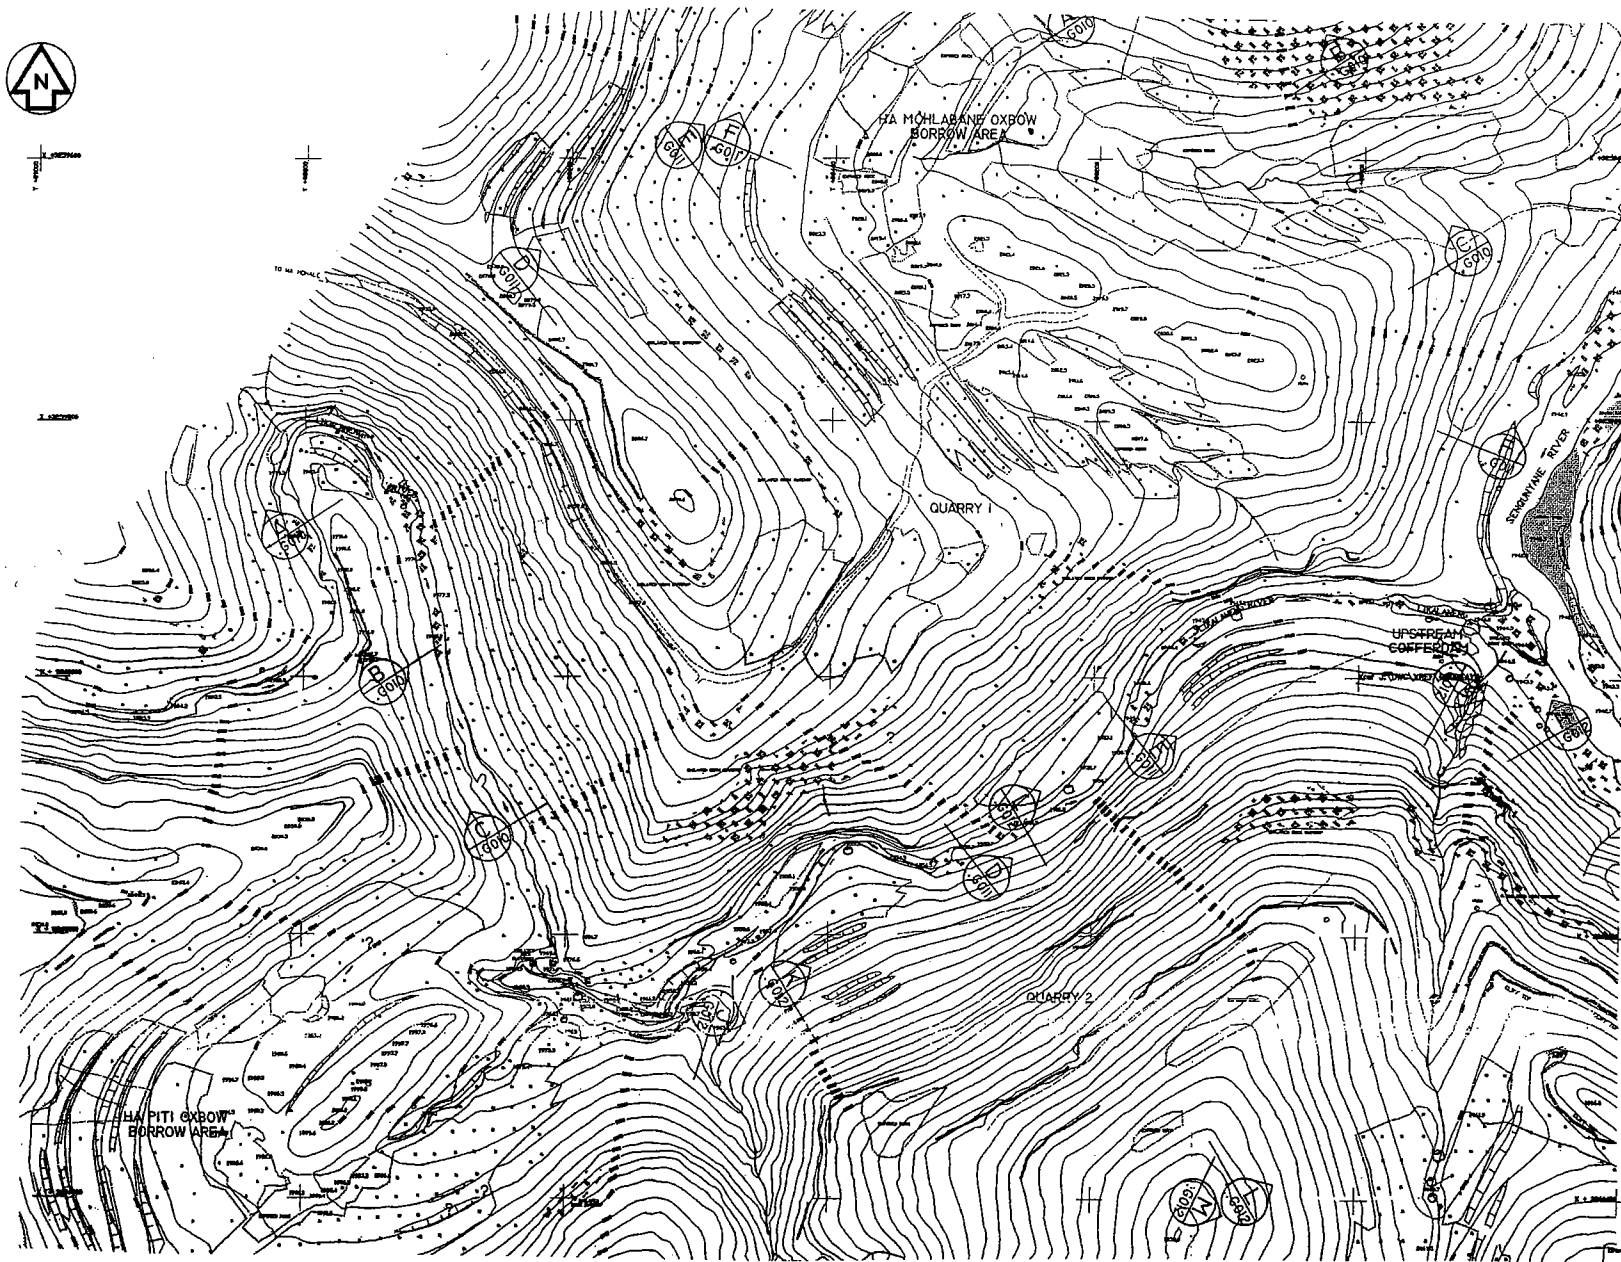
Quarry and Borrow Areas: Soils and Overburden
